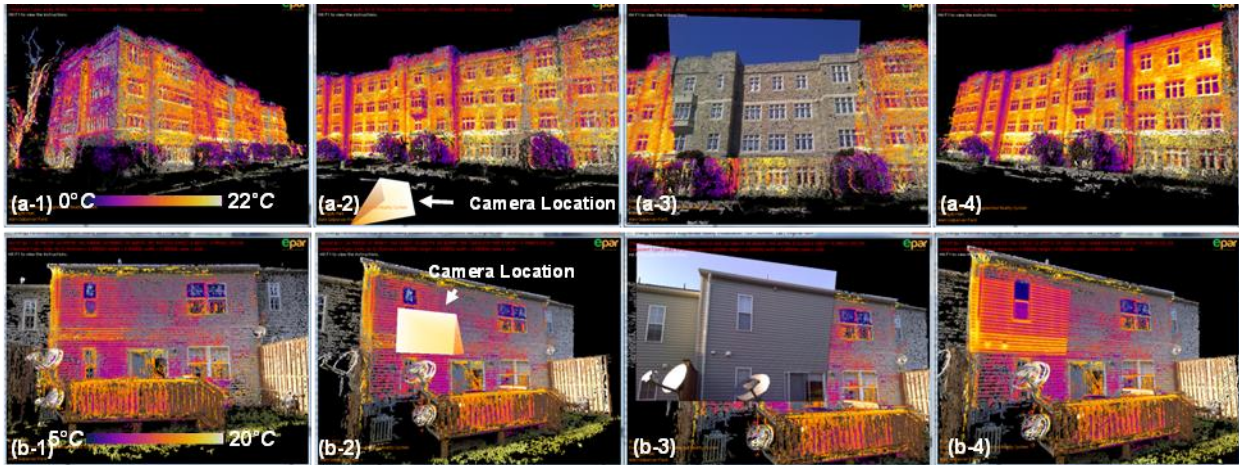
3D Spatio-Thermal Models with 3D-registered Digital and Thermal images: (a) the Façade of the Instructional Facility (IF#1); (b) the Façade of the Residential Building (RB#1)
